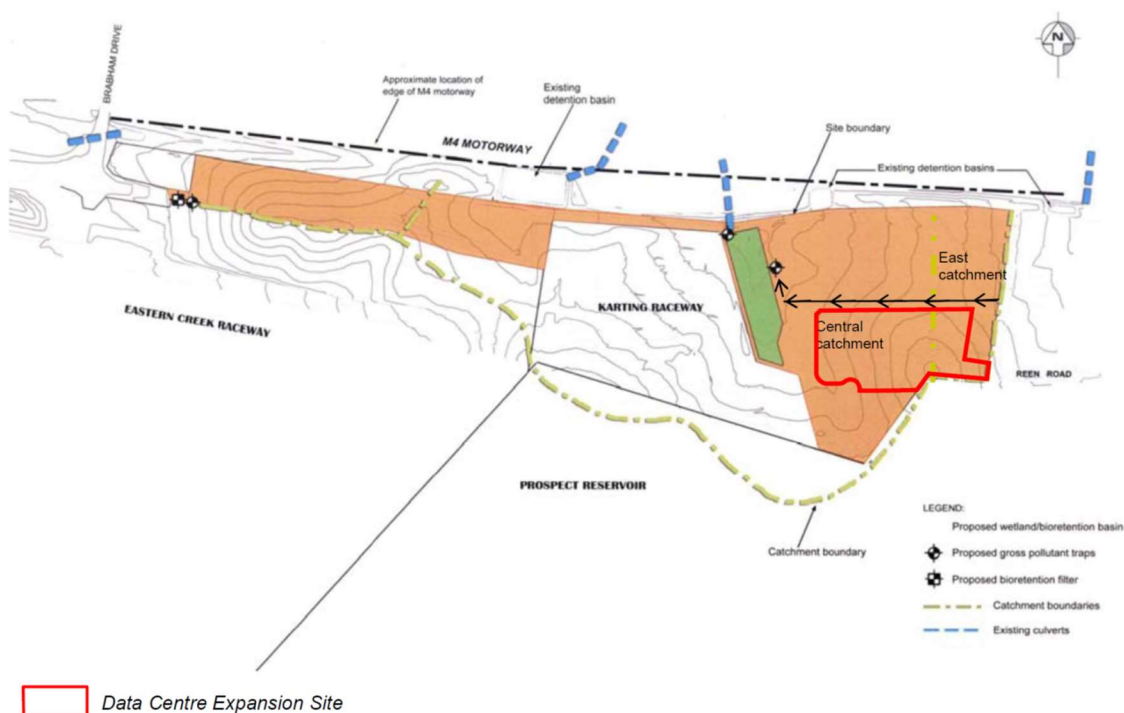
Precinct Stormwater Management Plan (Source: Precinct Plan and Patterson Britton SMP)
